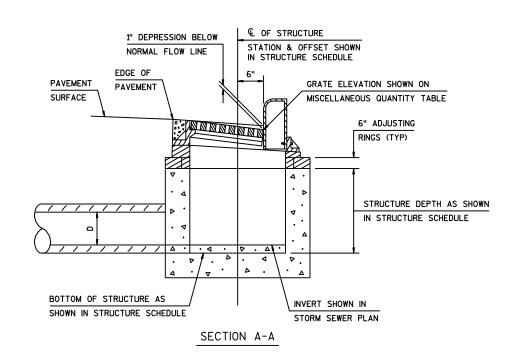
DETAIL OF CONNECTION TO EXISTING STORM SEWER
